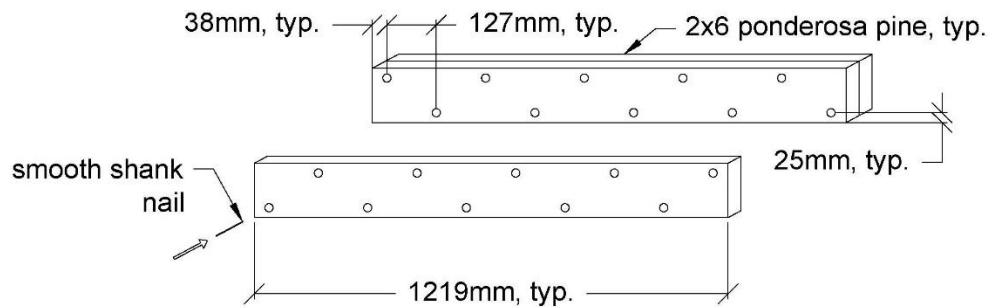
Nail pattern used for the construction of the NLT-concrete composite specimen
